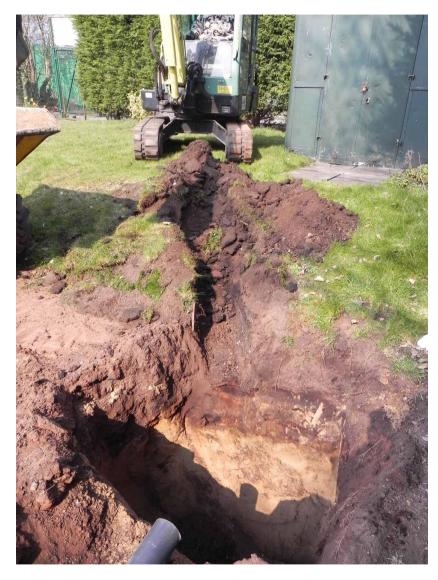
Excavation of cable trench and floodlight foundation in north-west corner of the old tennis courts. View looking north.
